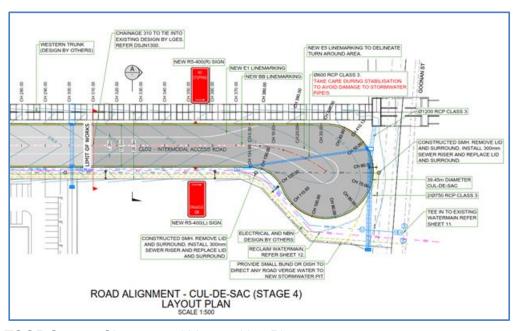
TGGP Stage 4 Signage and Linemarking Plan
